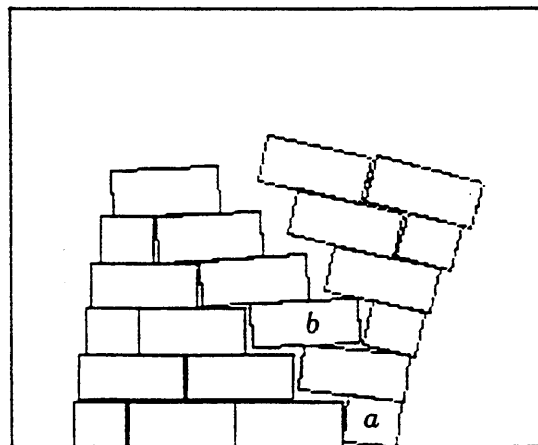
Failure mechanism of a 21-brick wall with geometrical imperfections.
